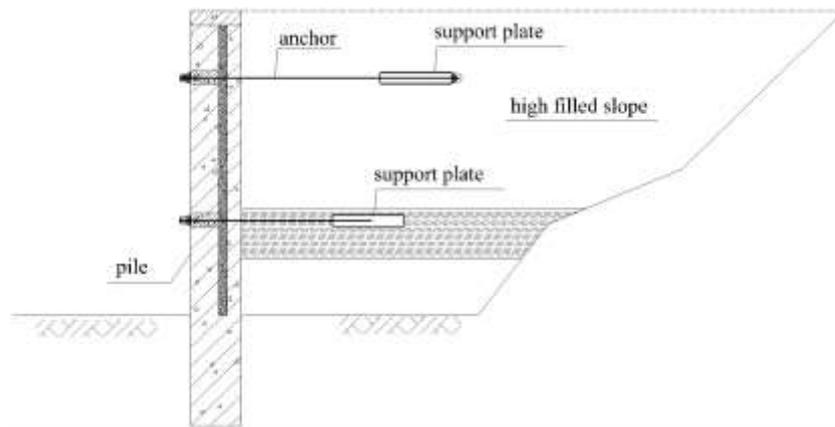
Flexible supporting system of Sheet-pile wall and Support-plate with Prestressed anchor
